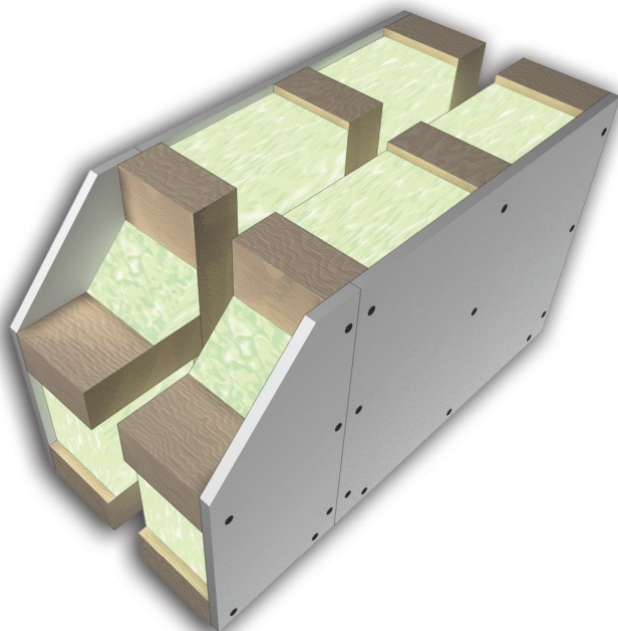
Timber Fire Wall Double Stud with Single Board Each Side
